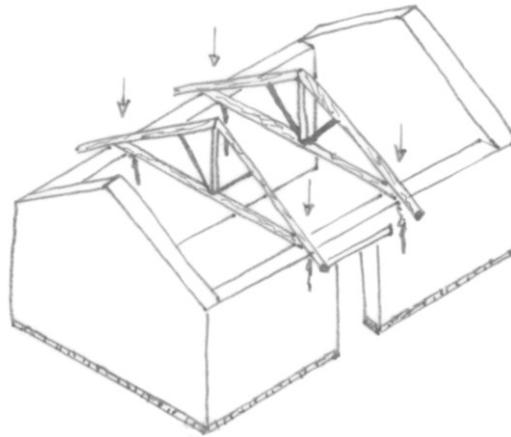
Incorrect distribution of the roof loads can damages the under structure
